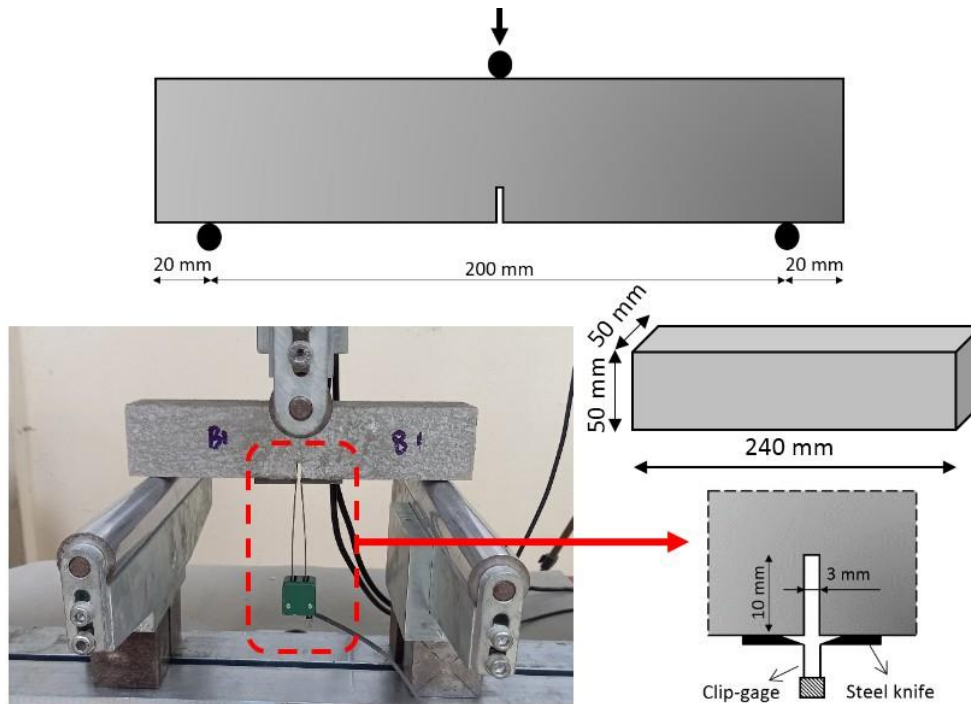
Fracture energy test setup, geometry of specimen and detail of notch.
